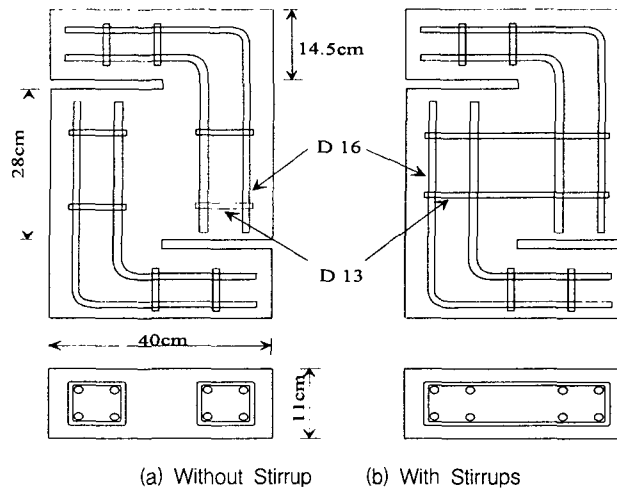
Geometry of Specimens and Reinforcement Distribution
